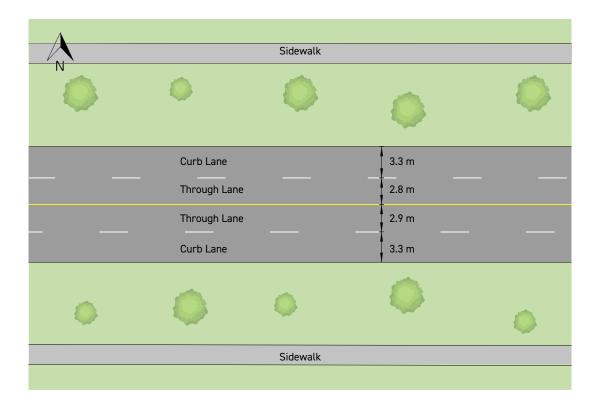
Example 9 - Configuration of Proposed Lane Widths
